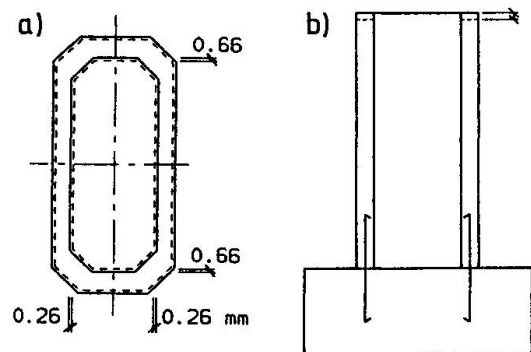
Horizontal and vertical movement requirements for the surrounding concrete.
